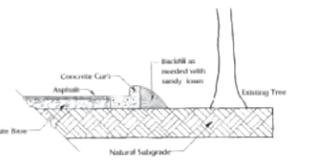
A "no-dig" type of pavement places the pavement section atop natural grade, thereby maintaining root disturbance and soil compaction. Extra reinforcement in the pavement and use of a geotextile under the base material may be needed to increase the stability of the pavement. (Adapted from a detail provided by Mary Ann Beale, City of Charlotte, North Carolina.)
